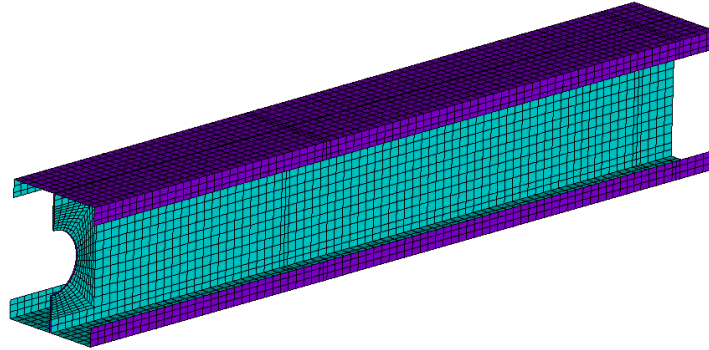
Typical finite element meshes of the CFS built-up beam with web perforations (Specimen OH0.5T1.9-136)
